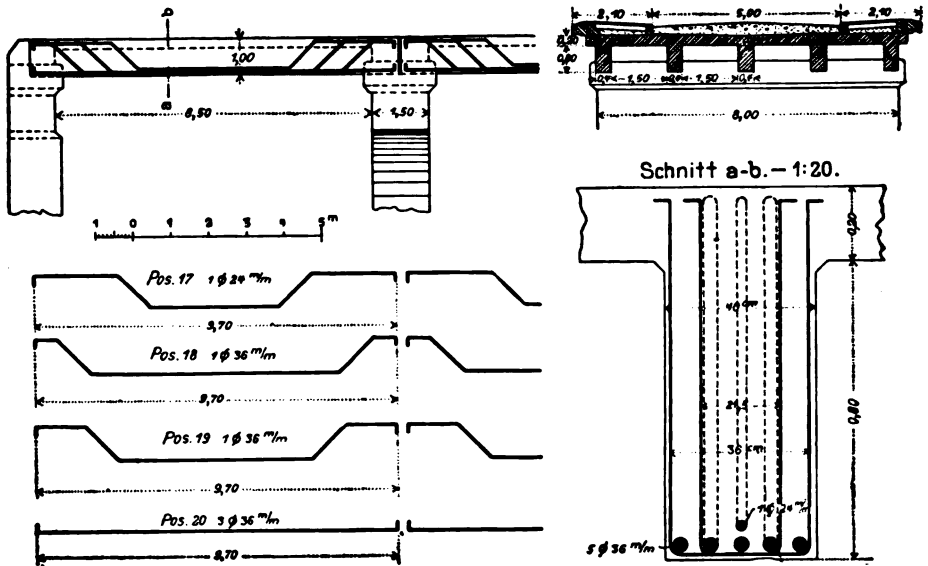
Thoroughfare construction between the piers on the left bank.
